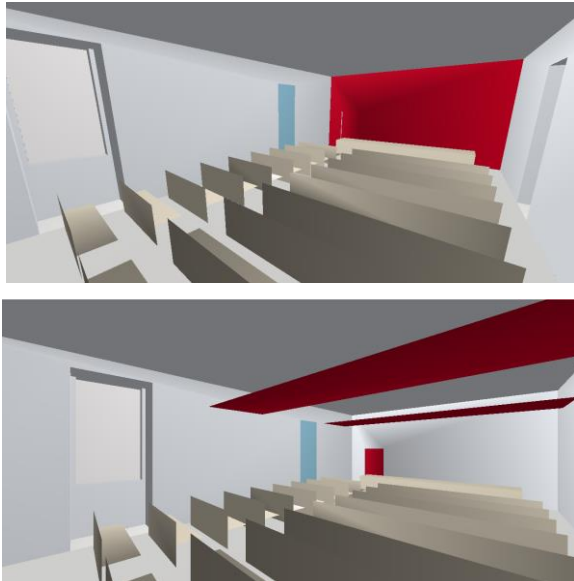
Panels on wall behind teacher and under the ceiling in the room S2.
